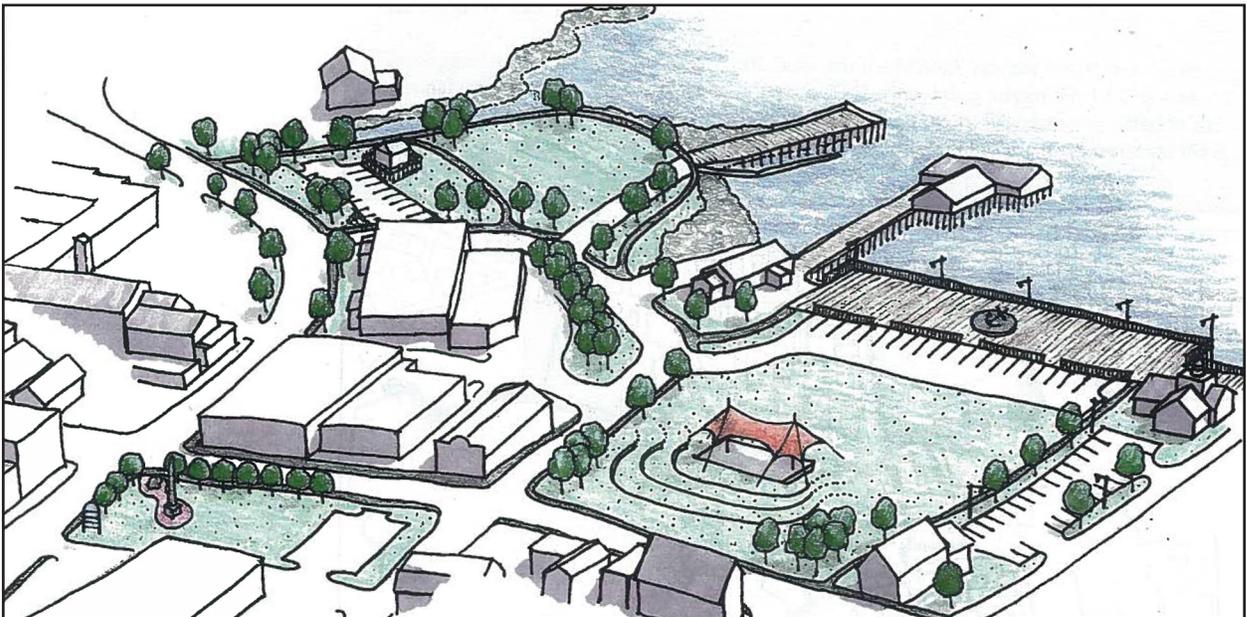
Proposed improvements to Harbor and Buoy Parks, with a new boardwalk and trail connections. (Source: 2005 Tillson District & Waterfront Redevelopment Plan)
